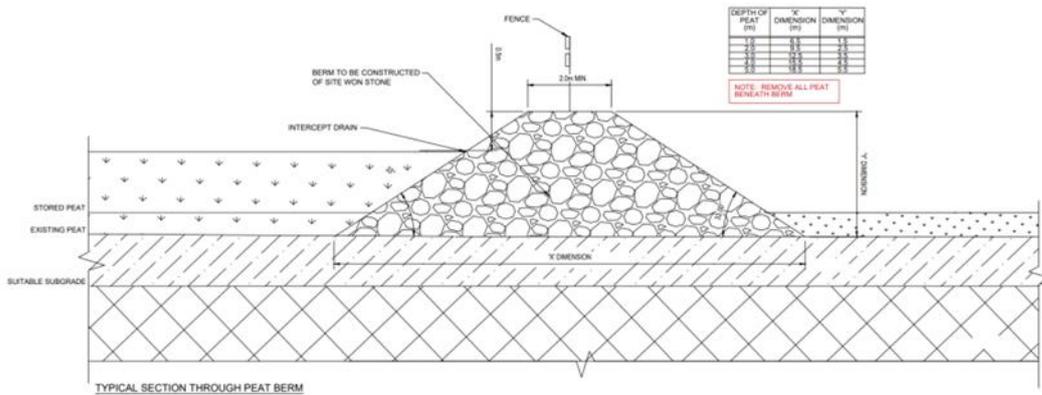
Cross-Section of a Peat Cell retaining Berm
